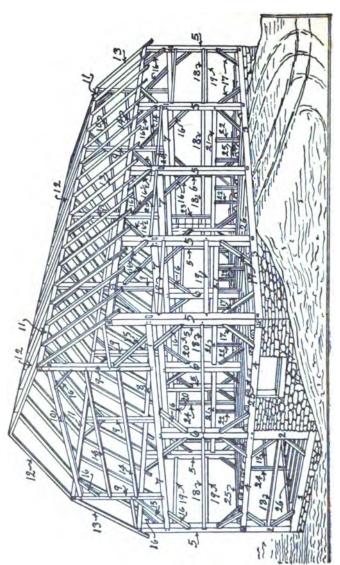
General Framing Plan for a Heavy Timber Barm.
